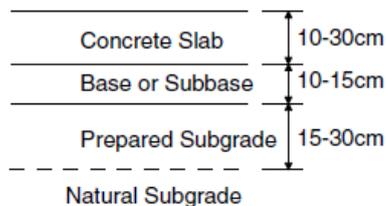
Typical cross section of rigid road pavement (T.F. Fwa.2006)
